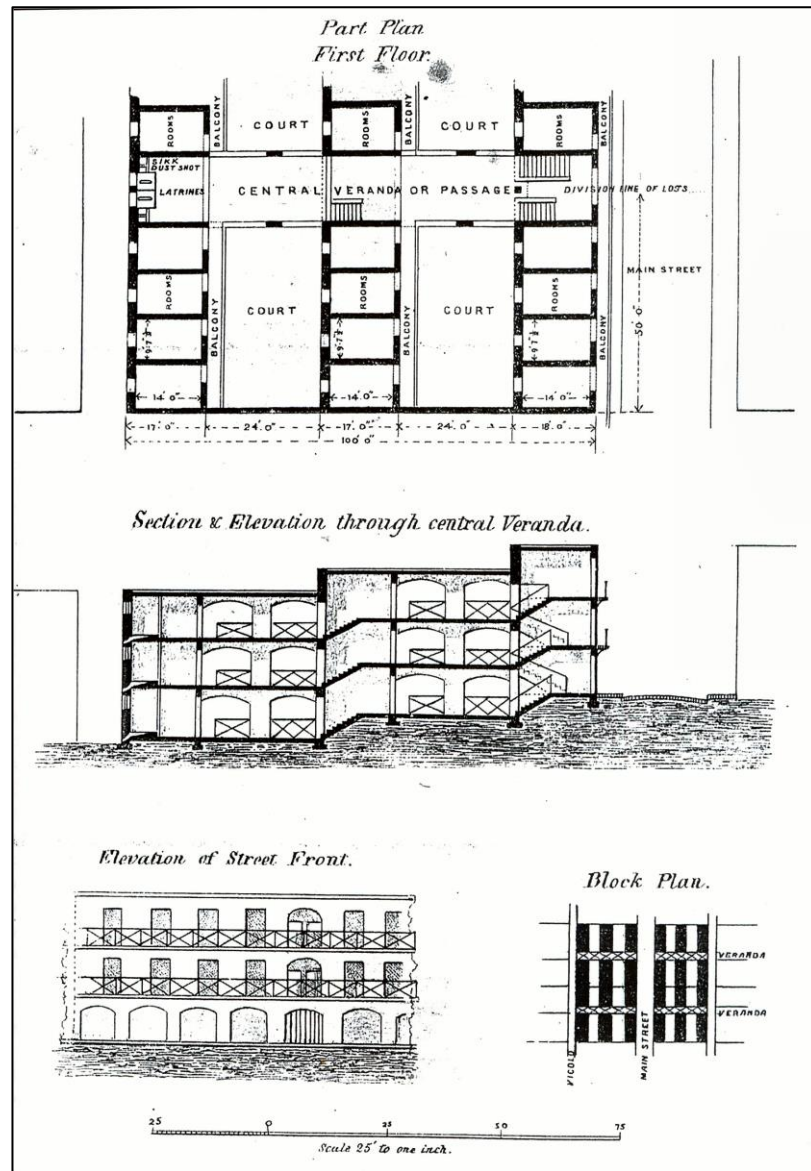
The second plan for crossroad (*New Street*) and proposed new dwellings for workers set around a central courtyard. (AWD)⁸⁴
